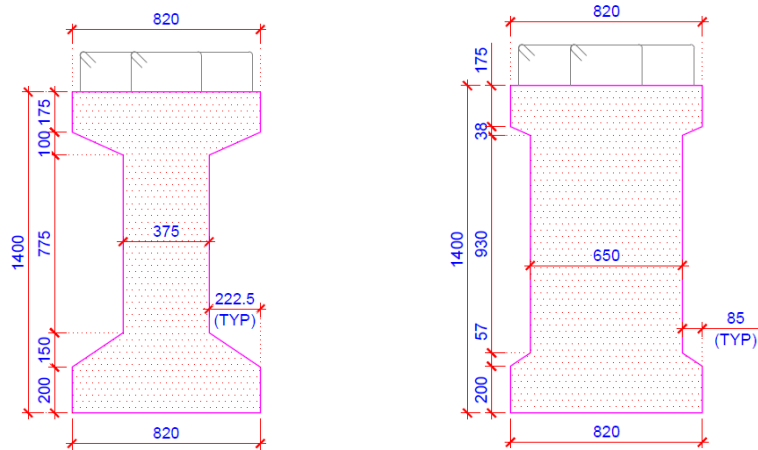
Cross section of PSC I-Girder (at Midspan & at Support)
